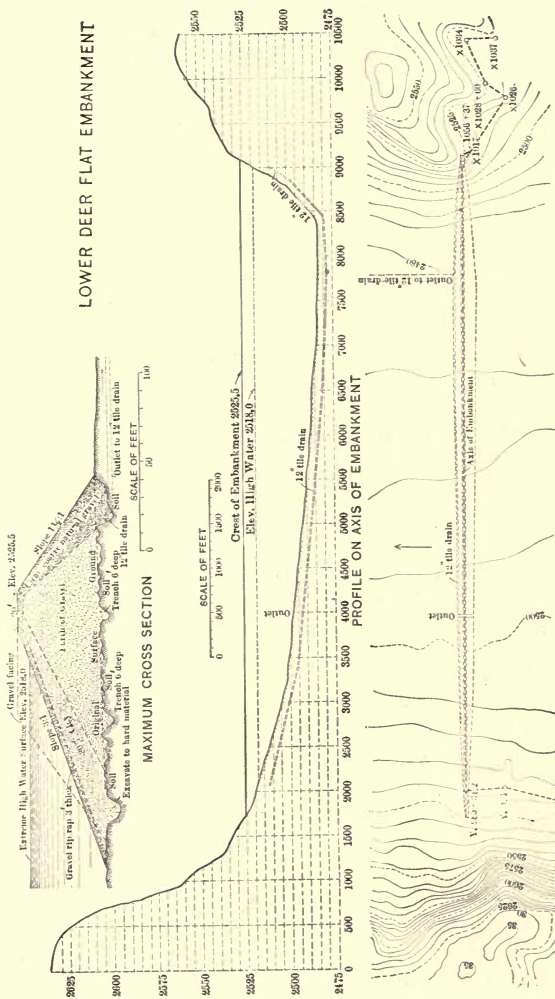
Profile, Plan, and Section of Lower Deer Flat Embankment, Boise Valley, Idaho.
